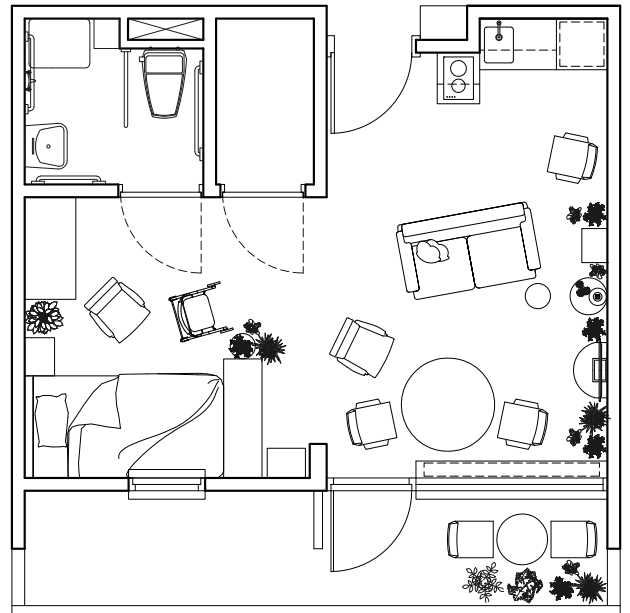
Floor plan of the room #02 (illustrated by author)
